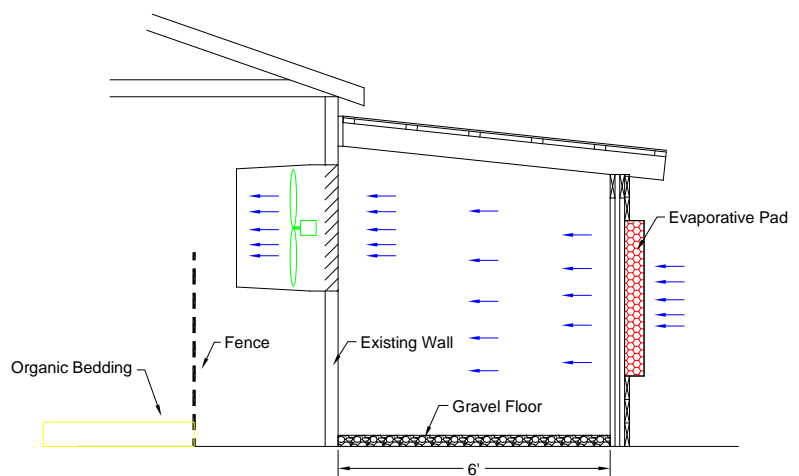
Cross section of air chamber and evaporative pad installed on north side of the KSU Maternity building.
